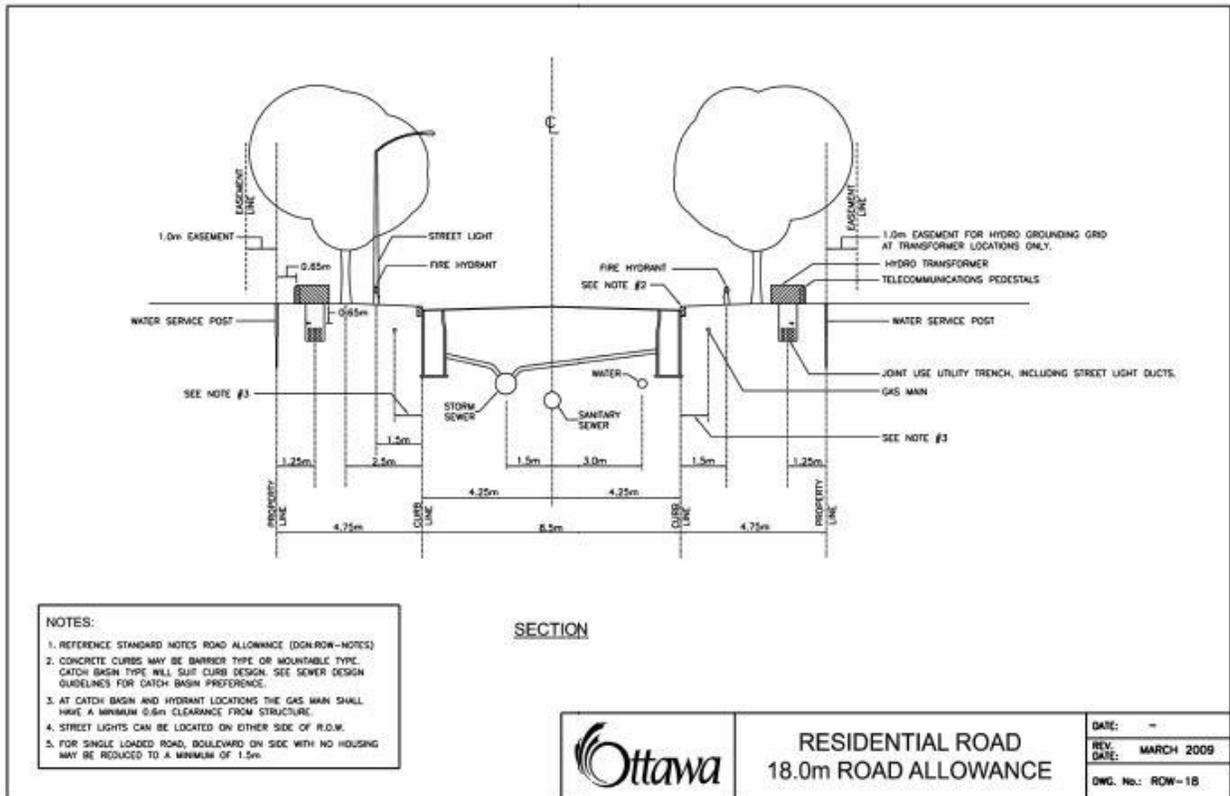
18 m Road Allowance (Local Roads), prepared by Stantec (August 18th, 2020)
